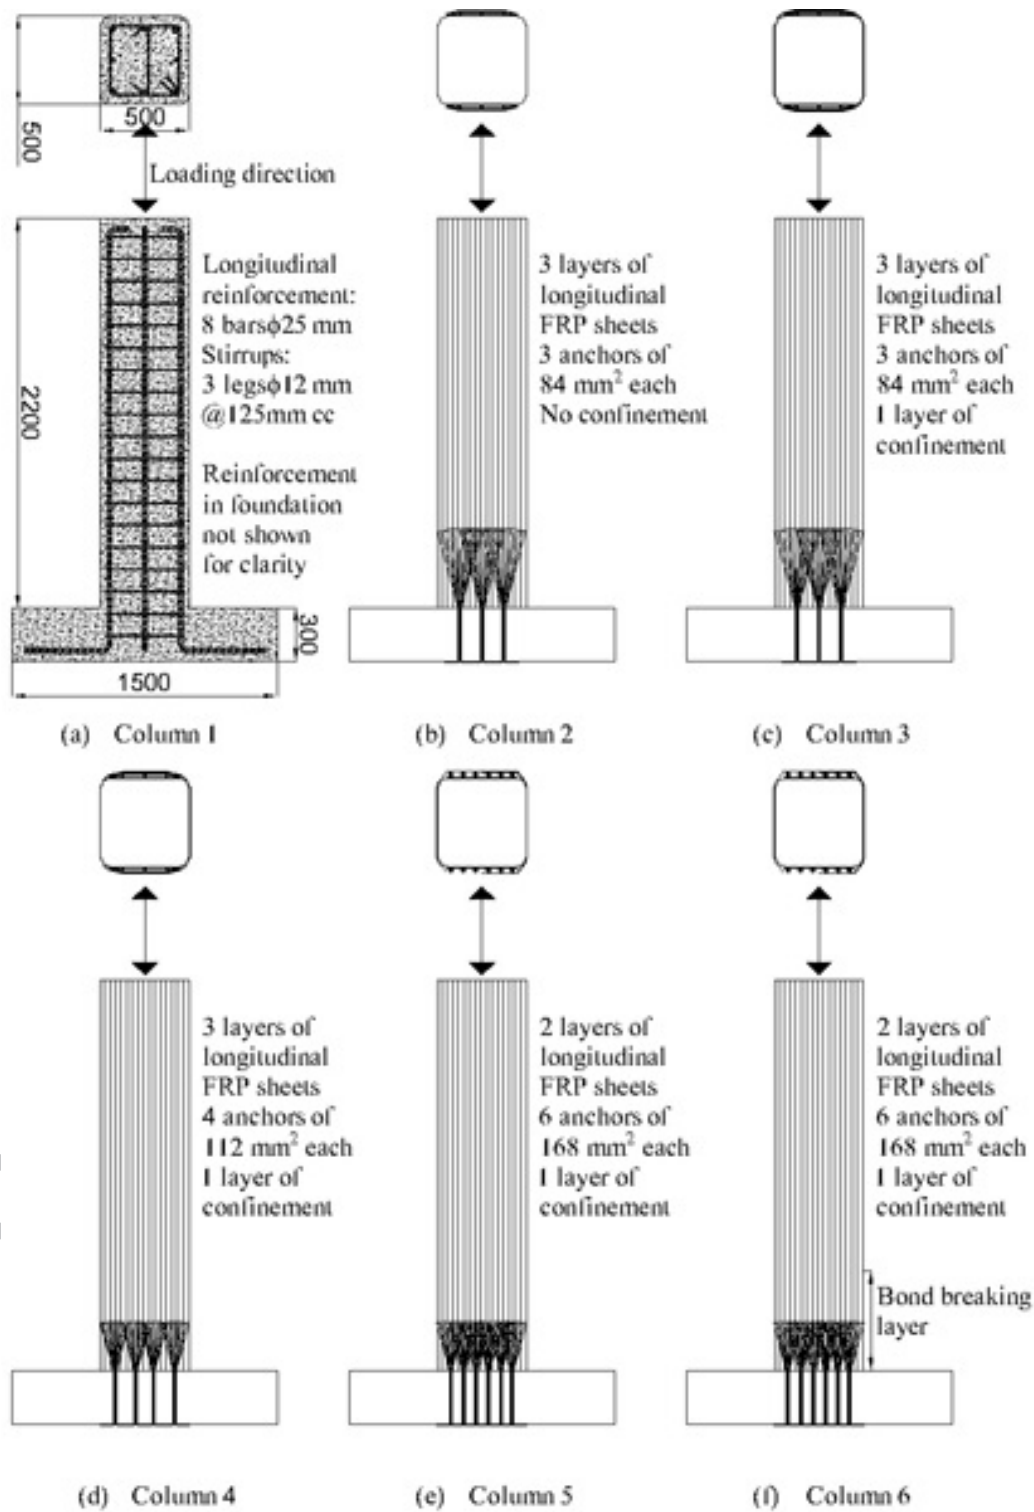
Columns dimensions, steel reinforcement and EBR-FRP details
